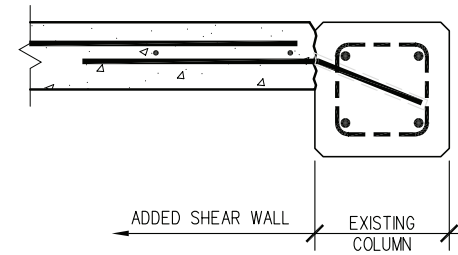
E: NEW SHEAR WALL AT EXIST. COL.
